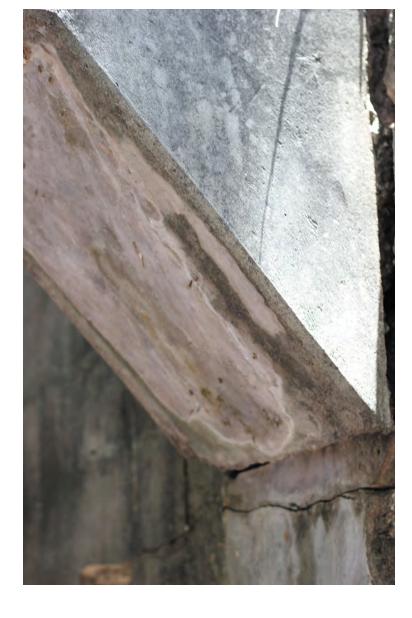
Detail view of the Japanese Jail concrete ruins.
